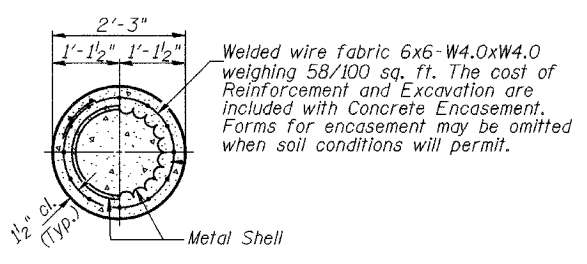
DETAIL OF PROTECTION FOR METAL SHELLS AT PIERS
